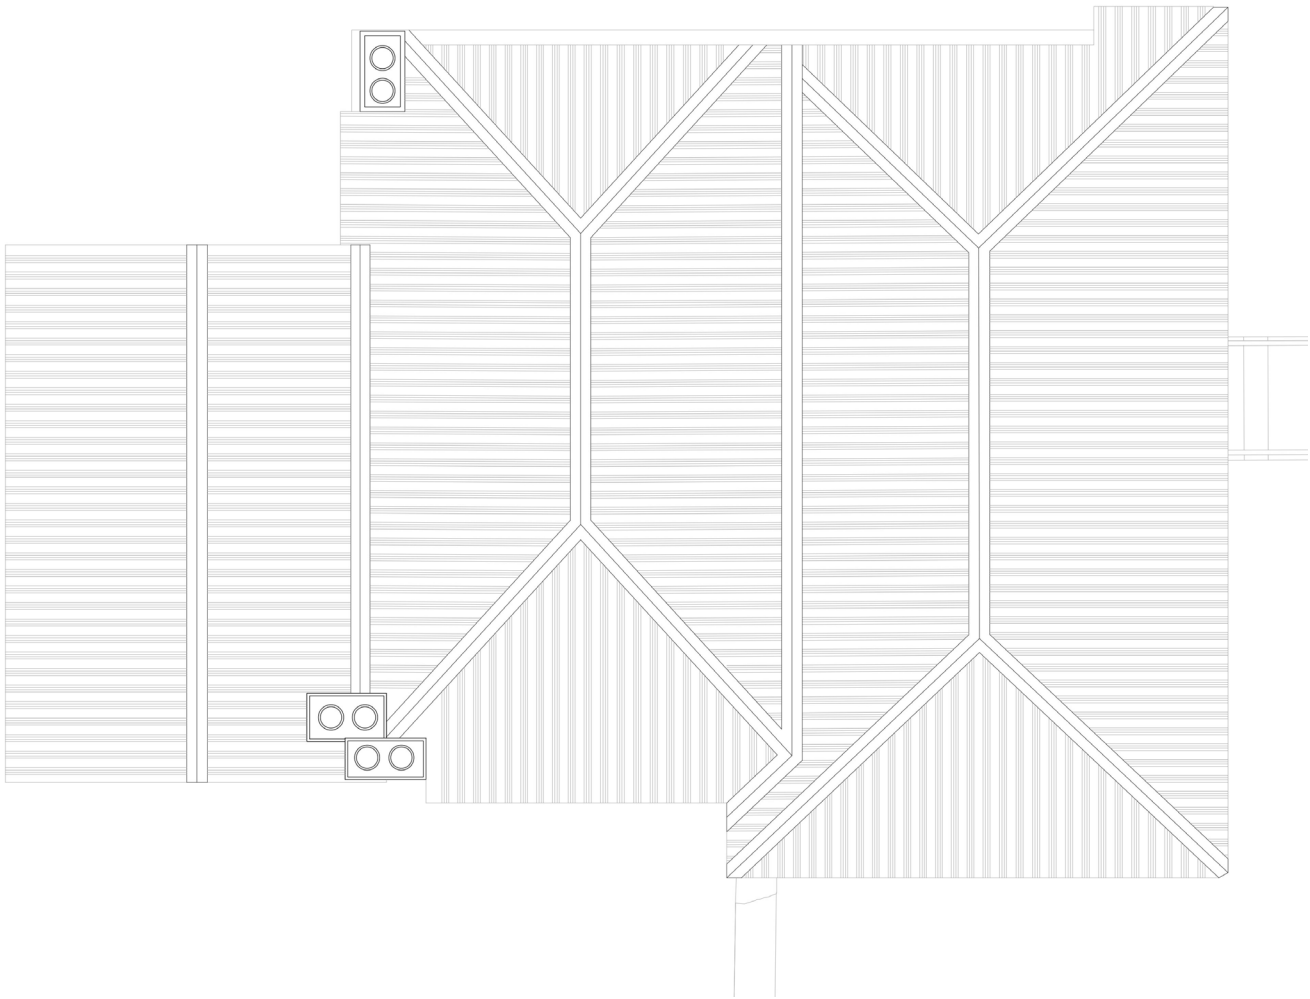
Roof Plan- Blackwood Associates Architects Survey
